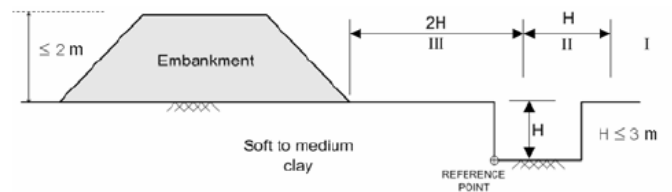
Protection zone of road embankment from nearby excavation suggested from results of analyses in this study (Soft subsoil condition).
